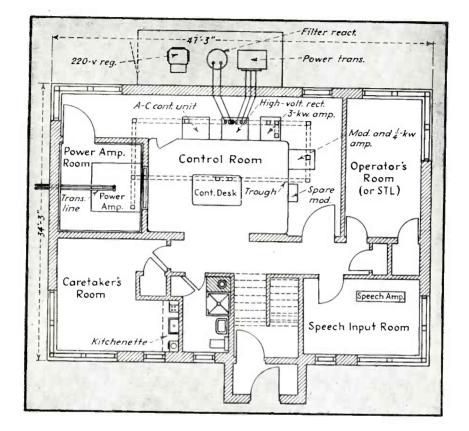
First-floor plan of the WMFM transmitter building at Richfield, Wisc.
